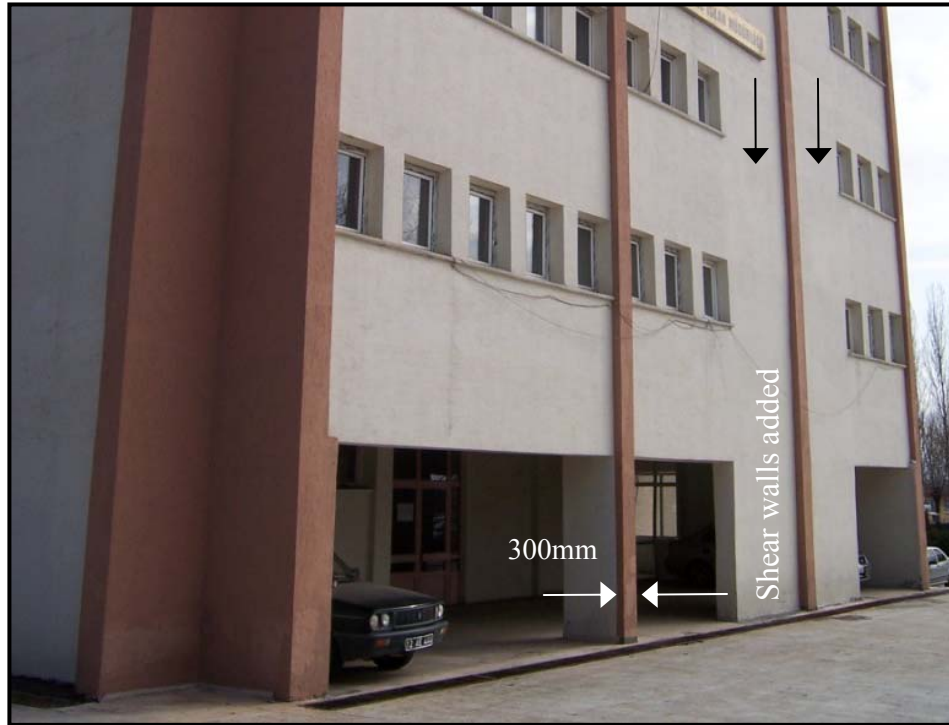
The front view of the Bingöl building after the retrofit. Shear walls added in the exterior frame.
